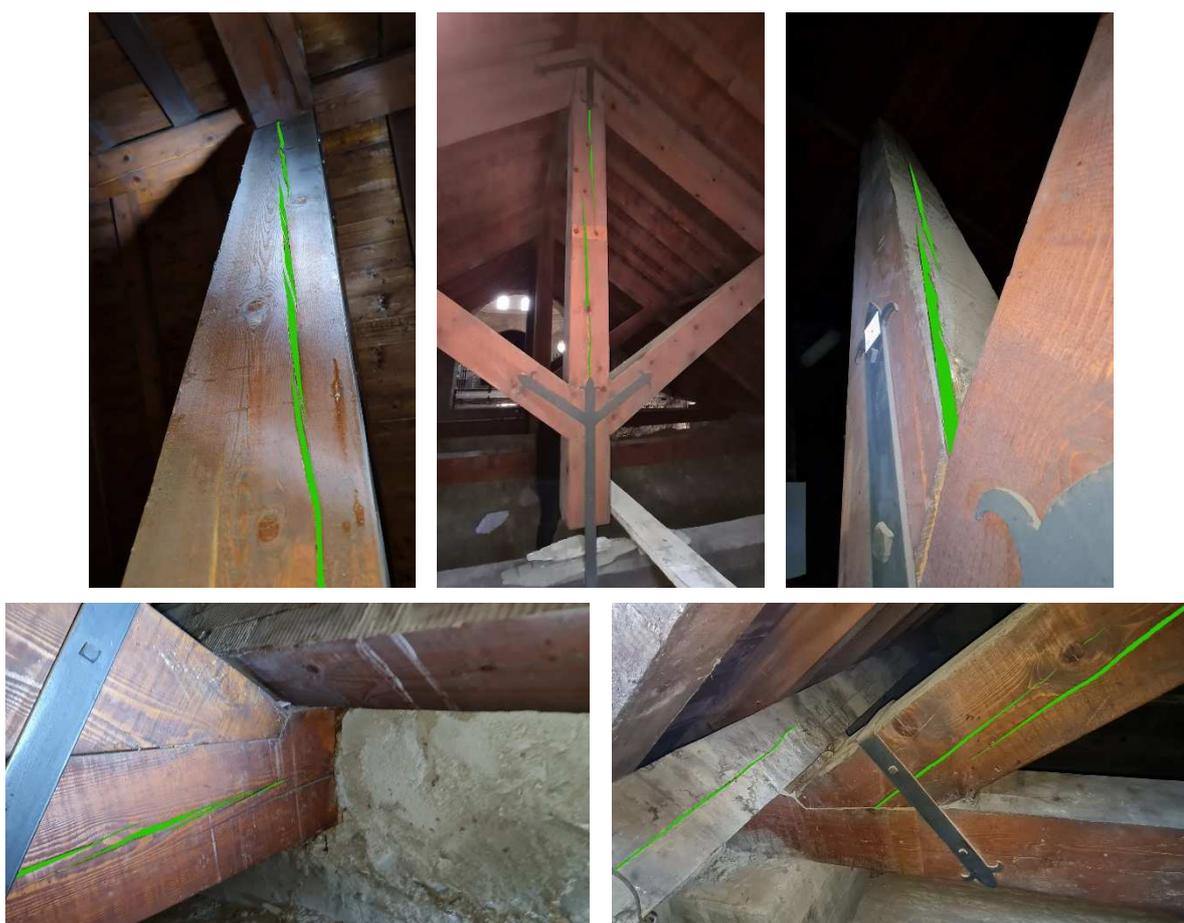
Crack (In Green Colour) in Wooden Warped Cross-Sections
